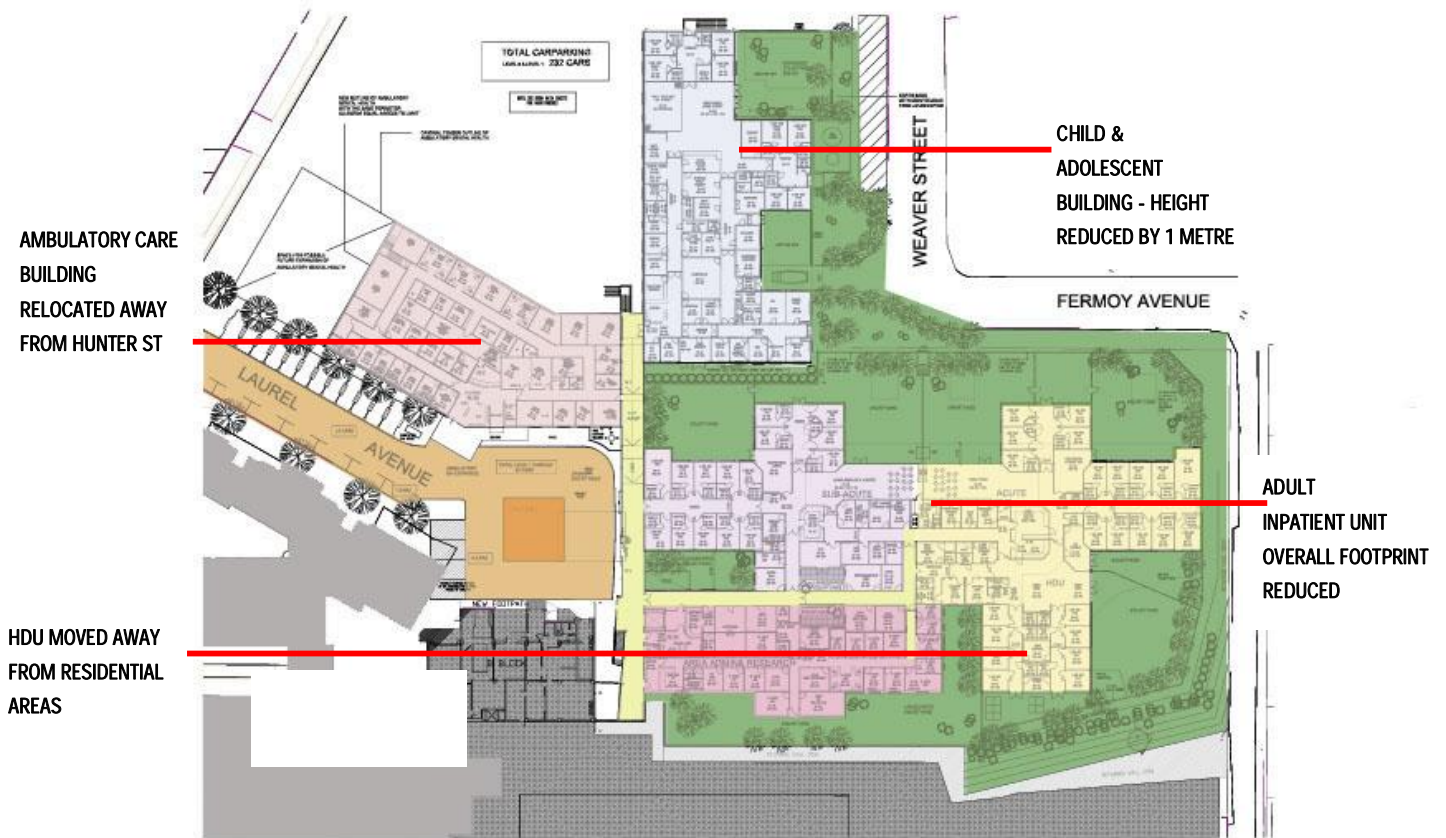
STAGE 1 NEW PSYCHIATRIC FACILITY REVISED MASTER PLANNING LEVEL 1
